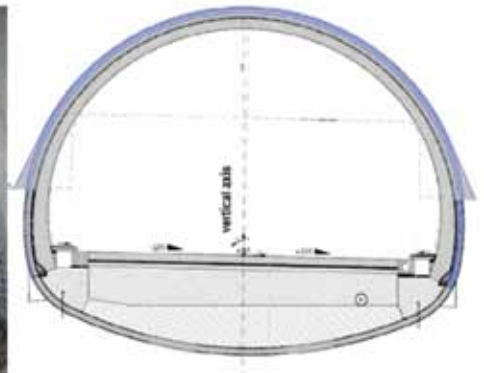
The final cross-section of right tunnel tube after reconstruction.
